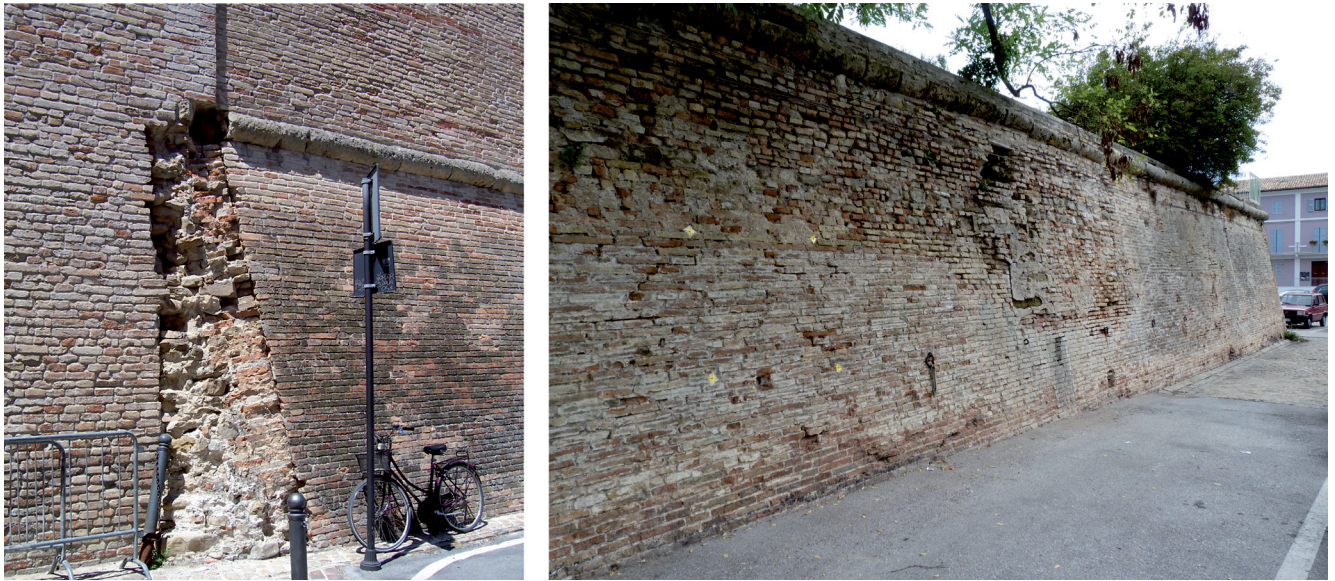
Left: section of the sixteenth century scarped walls near Porta Lambertina; it is possible to make out the characteristic 'rubble stone fill' structure, characterized by an orderly outer brick wall face with sporadic stonework elements, and an internal portion of filler (the internal façade is not visible here), chaotic, in which recycled materials of various nature may coexist, like whole or fragmented bricks and rocks; these are all immersed in mortar. Right: eighteenth century heavily eroded outer brick wall, Gothic brick wall pattern
